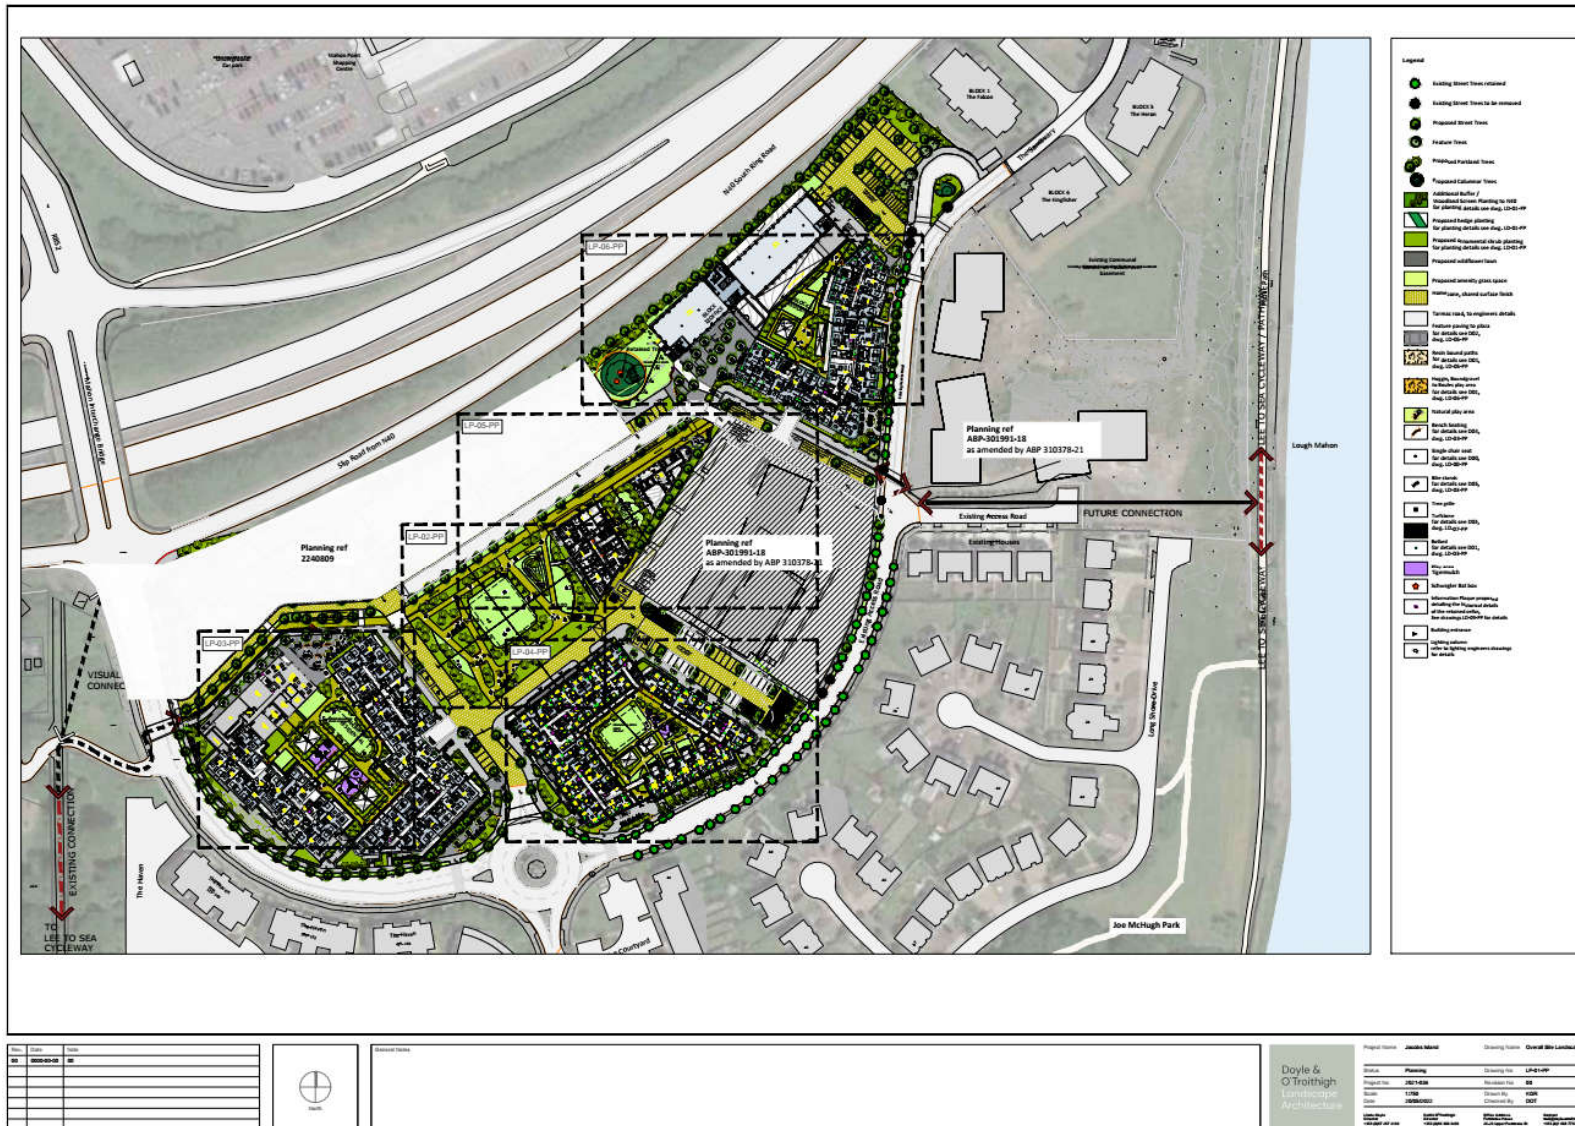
Landscape Plan (Source: Doyle O'Troithigh).
